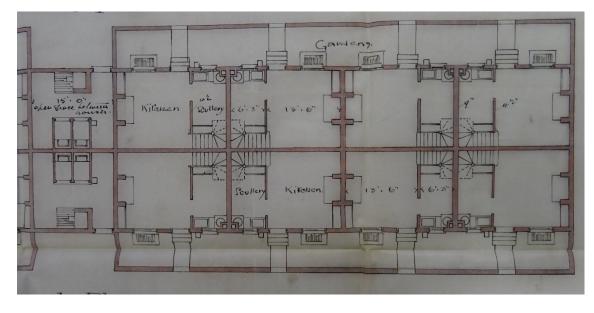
Ground floor plan showing the kitchen and scullery (John Hall and Sons 1892b). The sink and set-pot are near the scullery window, and each room has a built-in cupboard. Many houses had a plumbed-in bath in the scullery, but these houses did not have one. They do however have water closets (as opposed to earth closets) in the adjacent yard.
